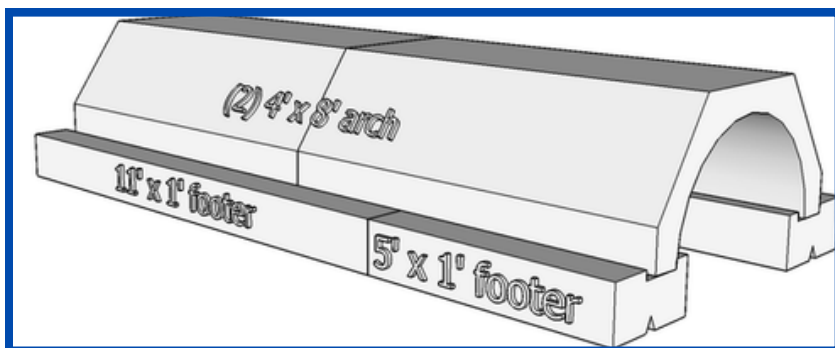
Dirigo Bridge Company. (n.d.). Box culverts and arch culverts. Precast Maine.
